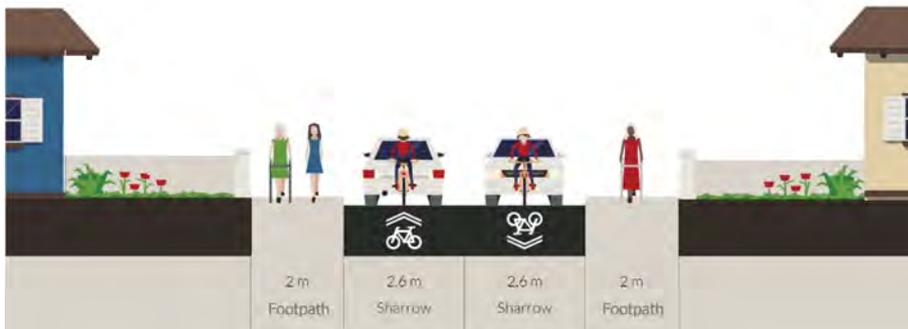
Route 4-1A, 4-1B, 4-2A & 4-2B Cross Section B-B Proposed
